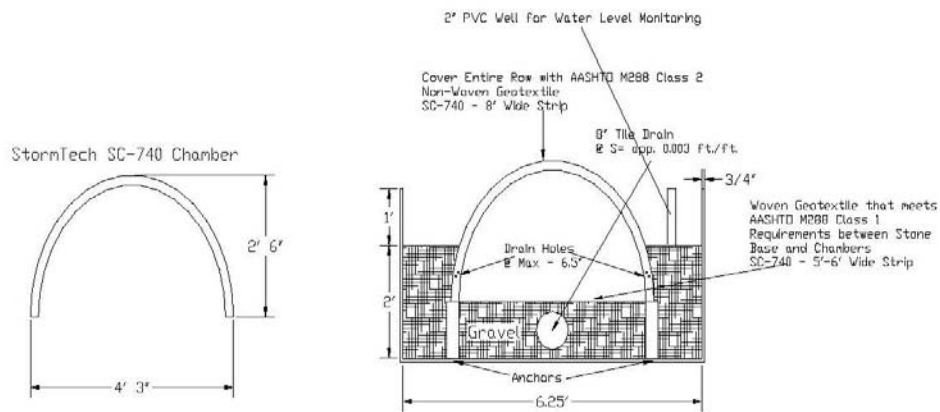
Section View of StormTech® Isolator™ Row as Installed in Lab
